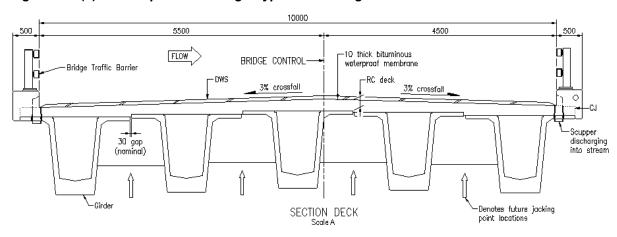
(d) - Concept GA Drawing - Typical section girders
